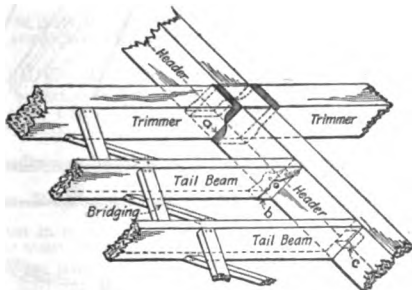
Floor Framing.—*a* is a double hanger or stirrup; *b* is a patent hanger; *c* is a common mortise.
